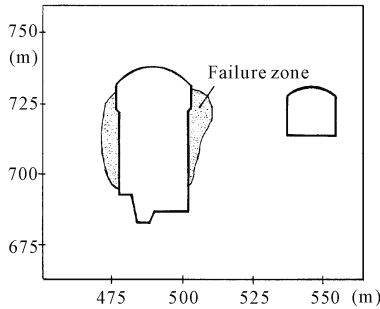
Failure zone of surrounding rock (*A-A* section)
